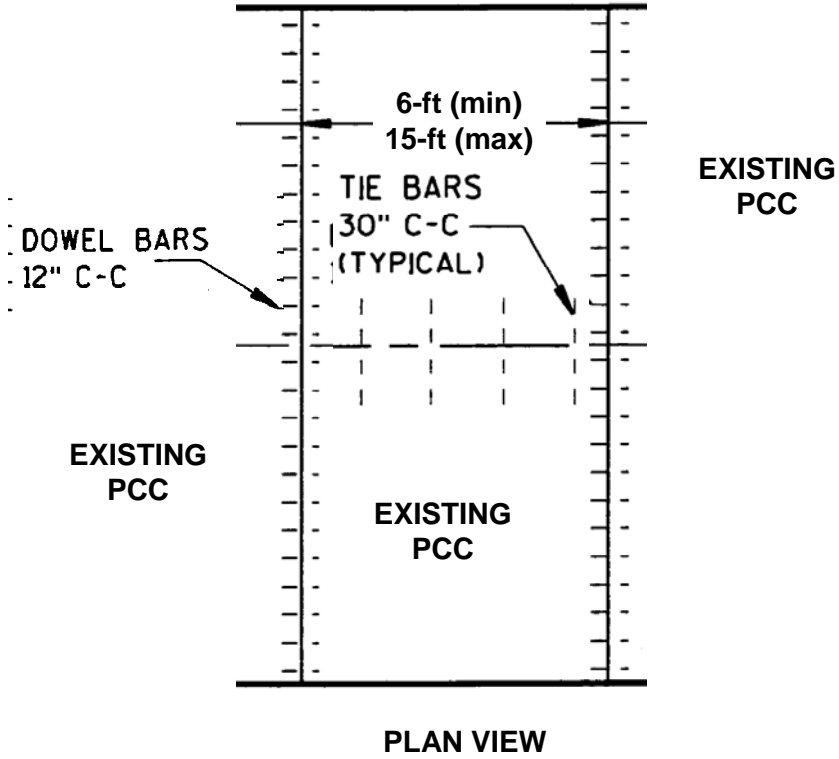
Plan details for transverse (dowels uniformly spaced) and longitudinal joints for full-depth repairs.^(2,3)
